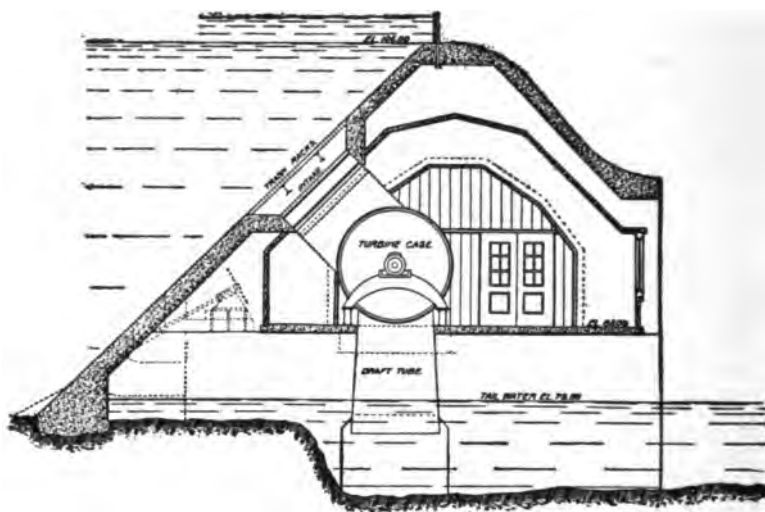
CROSS-SECTION OF PATAPSCO DAM AND POWER-HOUSE INSIDE.
